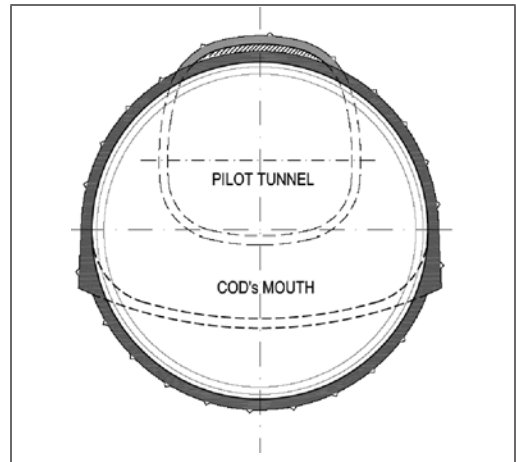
Tunnel cross section with pilot tunnel and “Cod’s Mouth” profile
